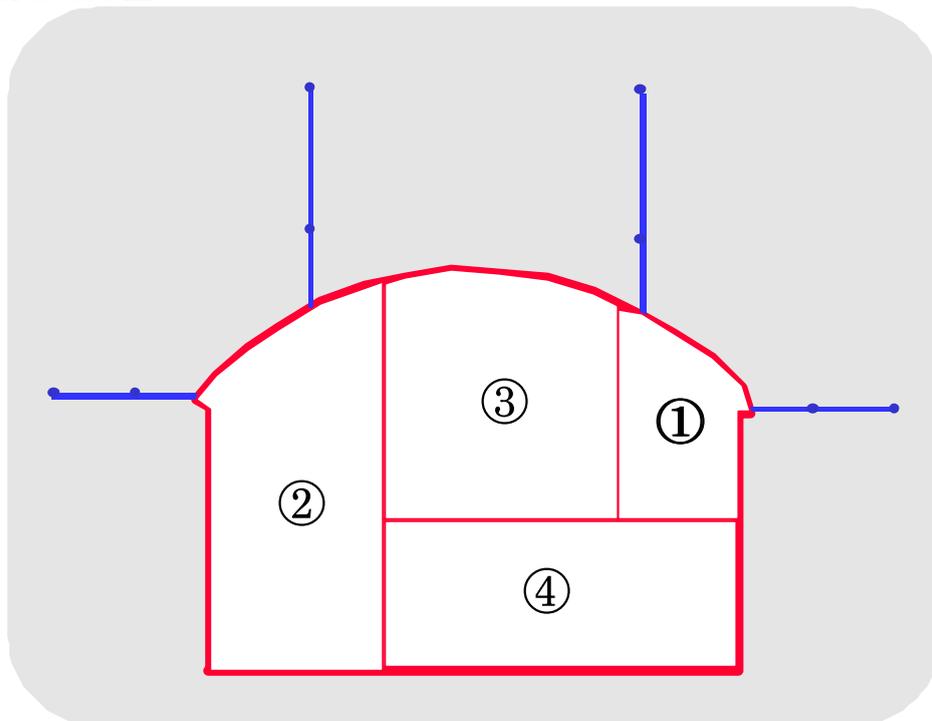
Cross section of the Luzzone tunnel with excavation section and SOFO sensors emplacement.
